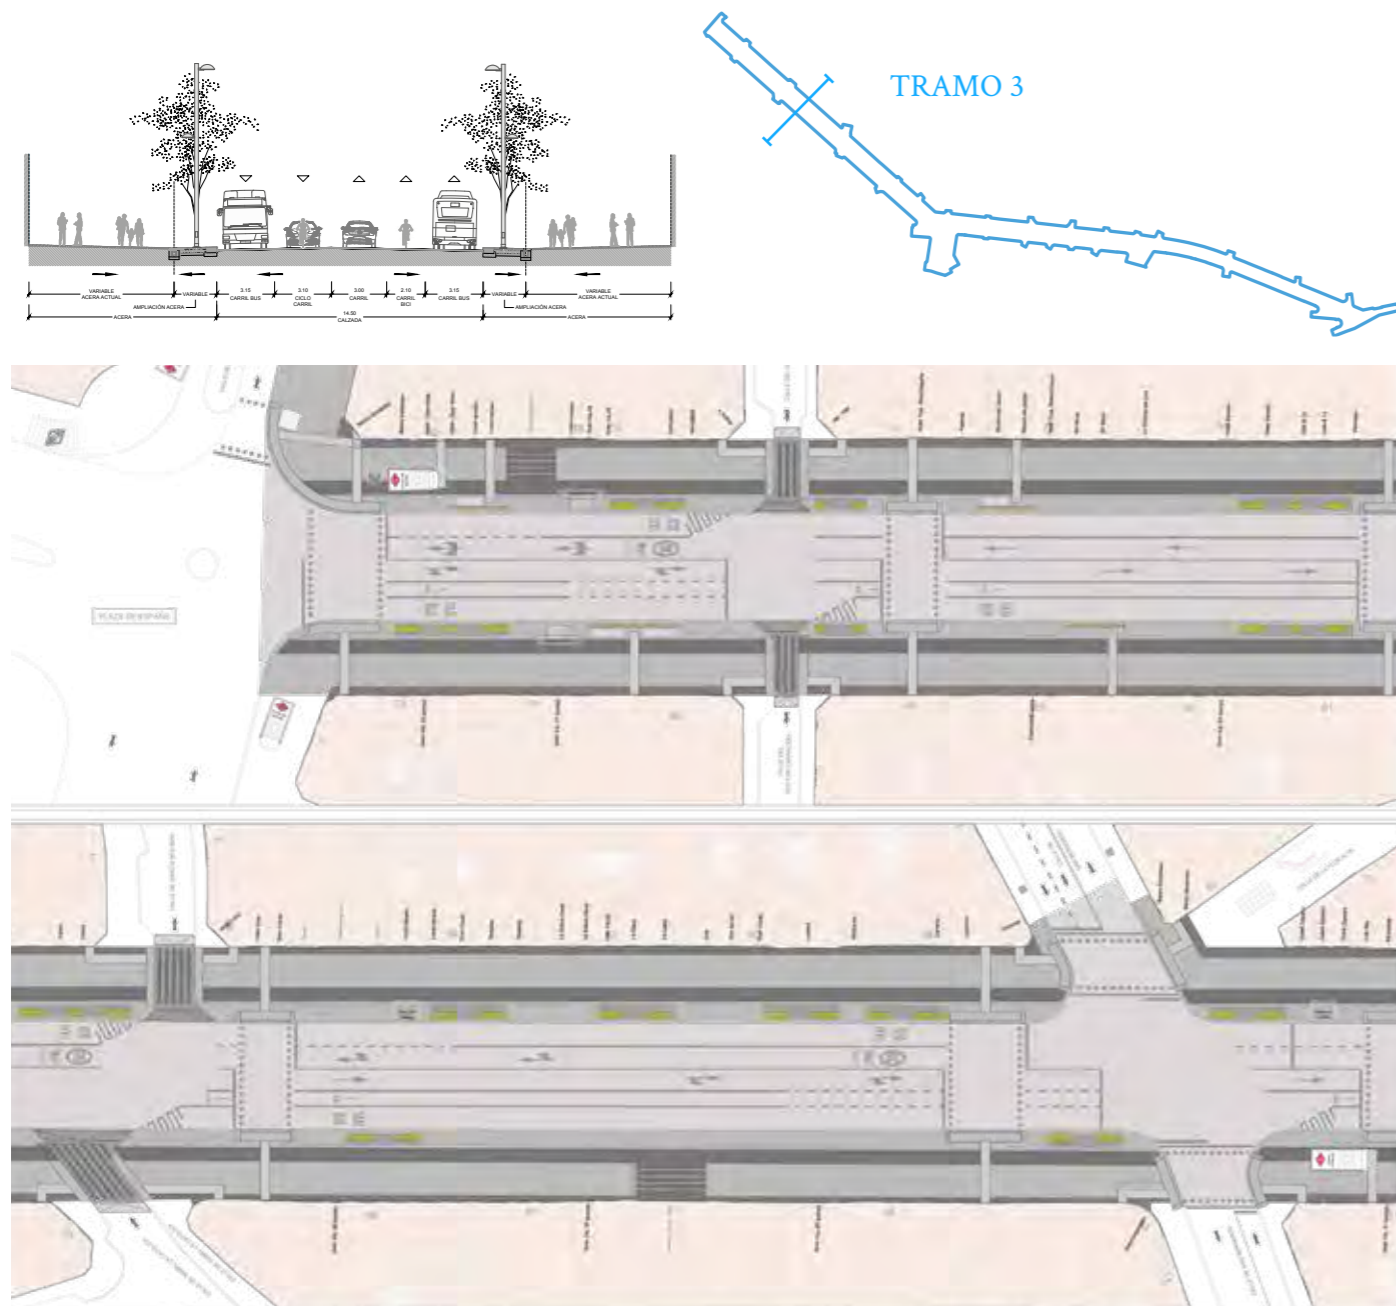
Standard plan and cross-section of the remodelling project. Section 3: Plaza de España - Calle de San Bernardo. - Source: Ayuntamiento de Madrid
